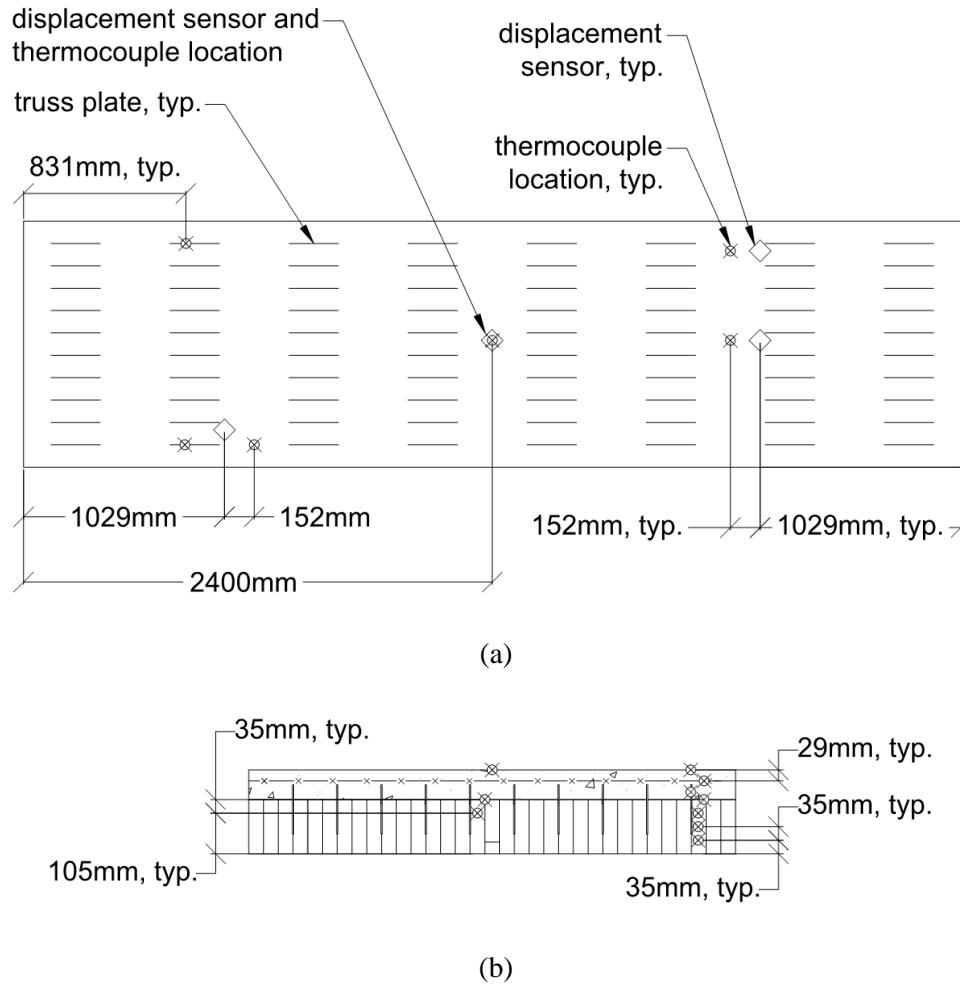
NLT-concrete composite floor in (a) plan view showing thermocouple and displacement sensor locations and (b) section showing typical depths of thermocouples
